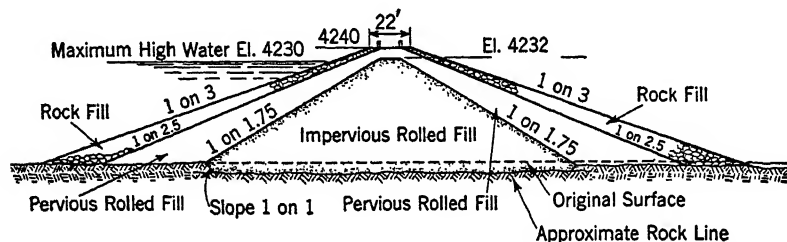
North and South Dikes, Conchas Dam, New Mexico. (From "Design and Construction of Conchas Dam," U. S. Engineer Office, Caddoa, Colo.)
